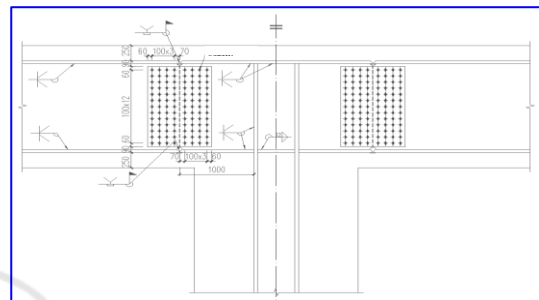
Large sample of frame support wallcolumn and transfer beam joint
